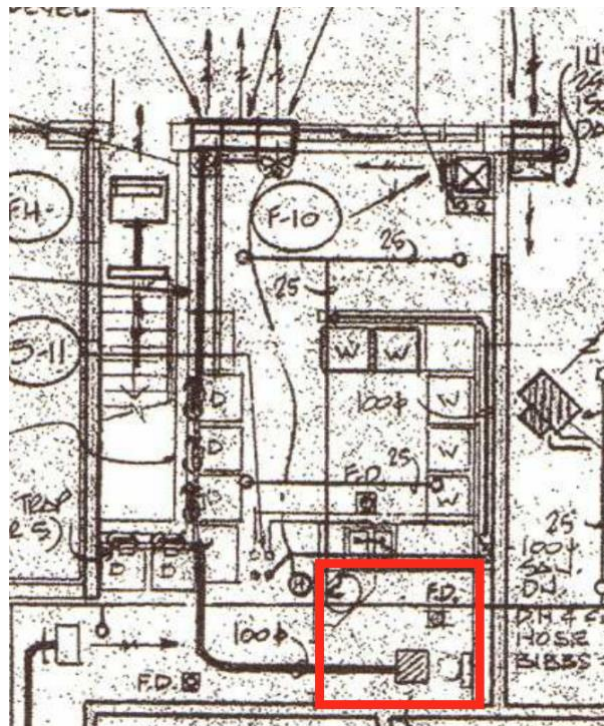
A snapshot taken of the laundry room's floor plan. The highlighted section represents the washroom which the client has stated can be removed [Client Provided].
